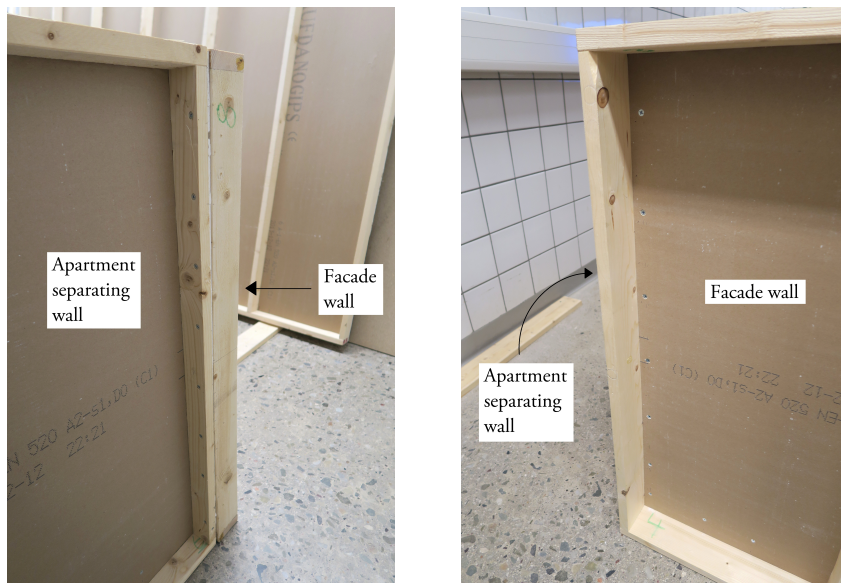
Photographs of a junction between an apartment separating wall and a facade wall in the upper room. In the right photograph, the apartment separating wall cannot be seen, but the arrow indicates its placement.
